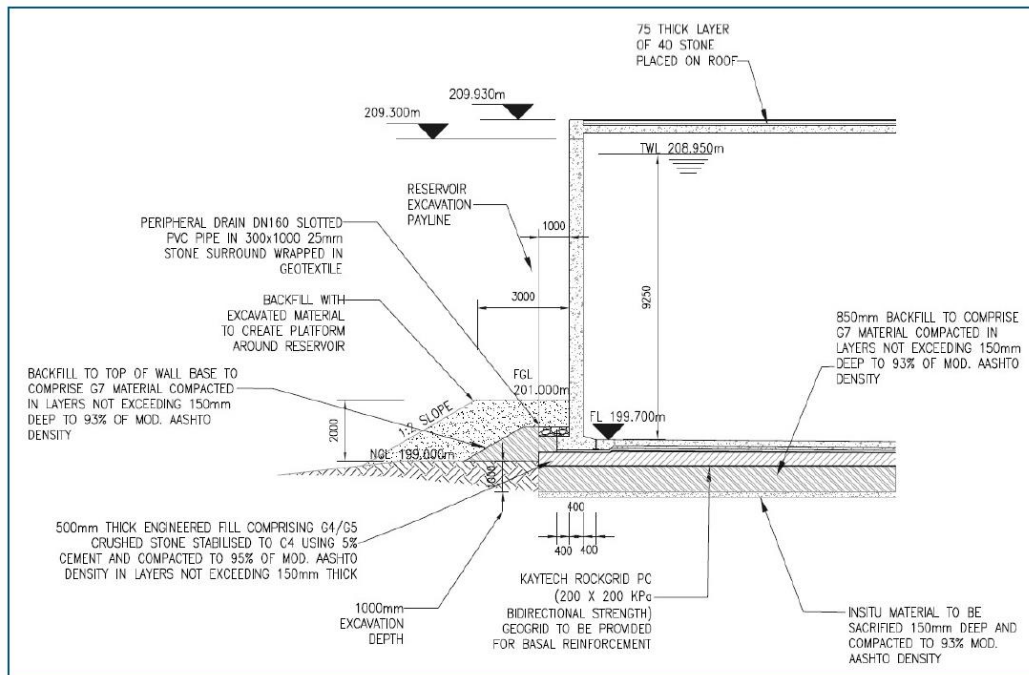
Circular reservoir wall section and foundation (from Royal Haskoning DHV Engineering Report).
